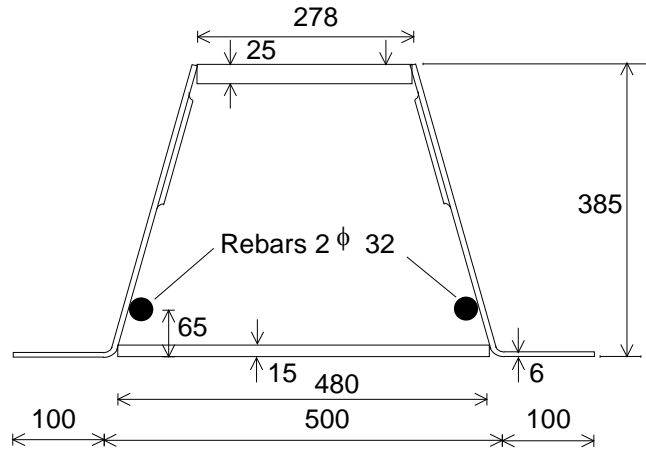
Cross-section of Delta beam. The rebars were welded to the webs of the beam.
